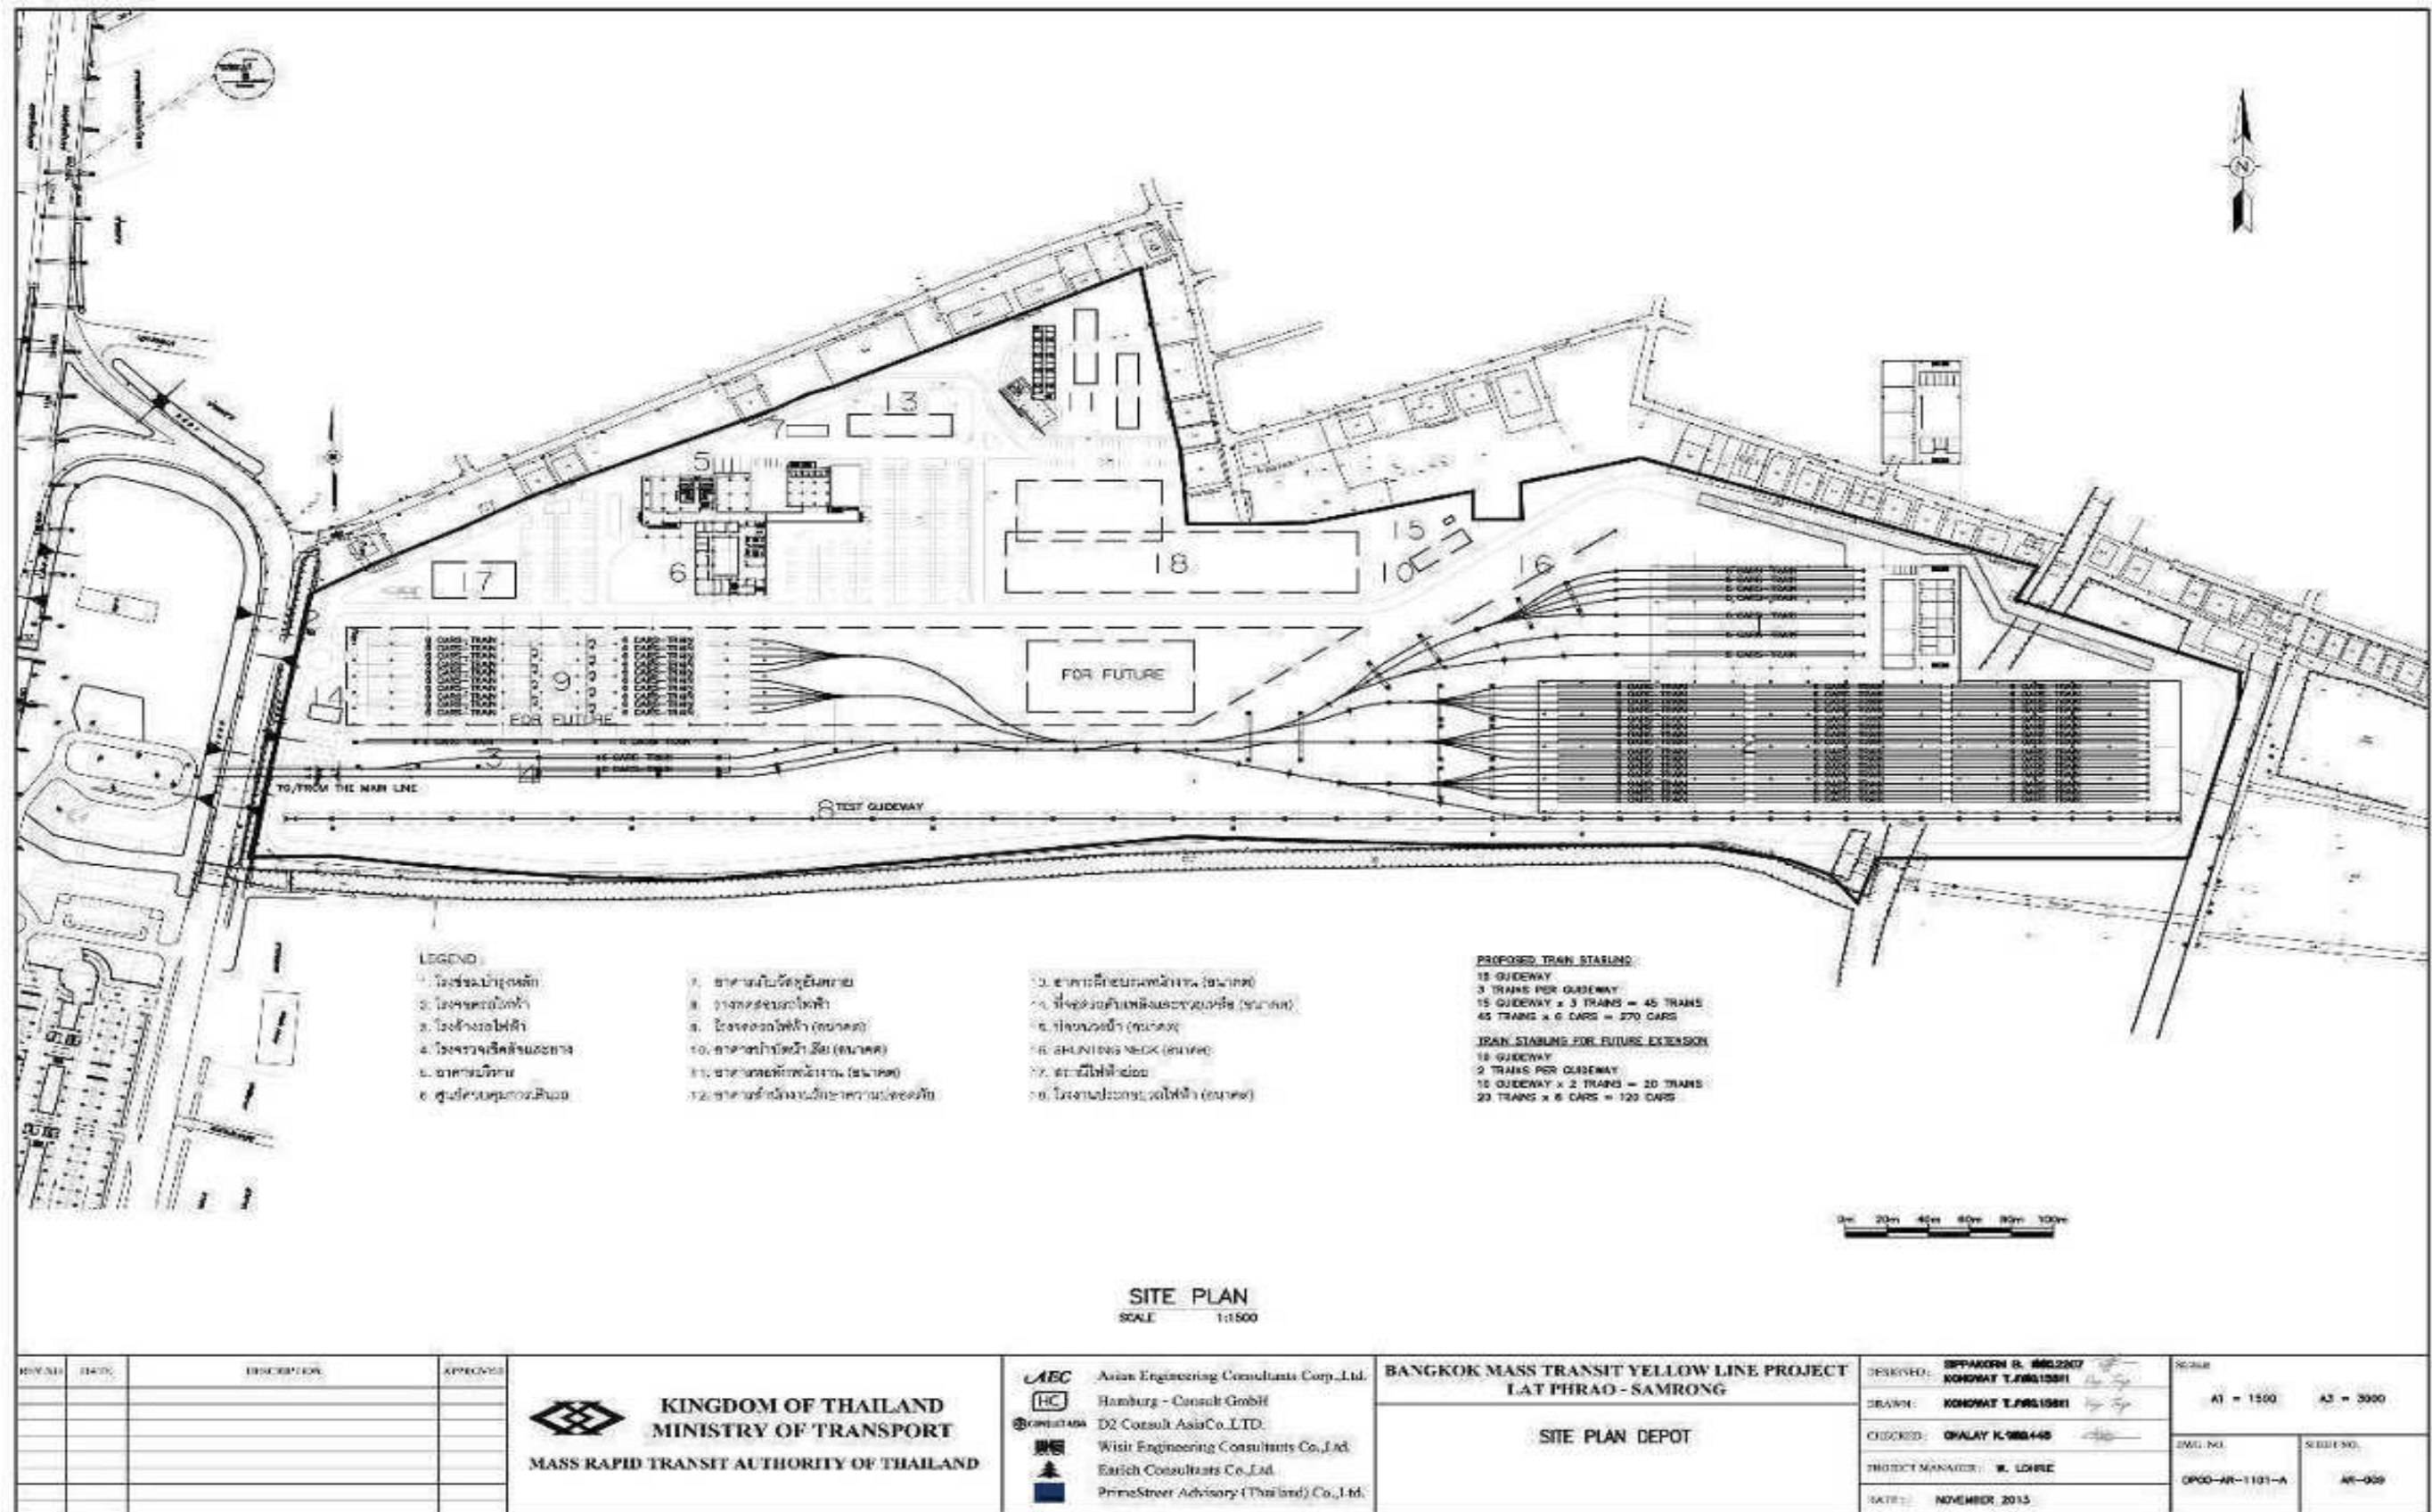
1 Lay out plan of the Depot at Si lam Interchange.
